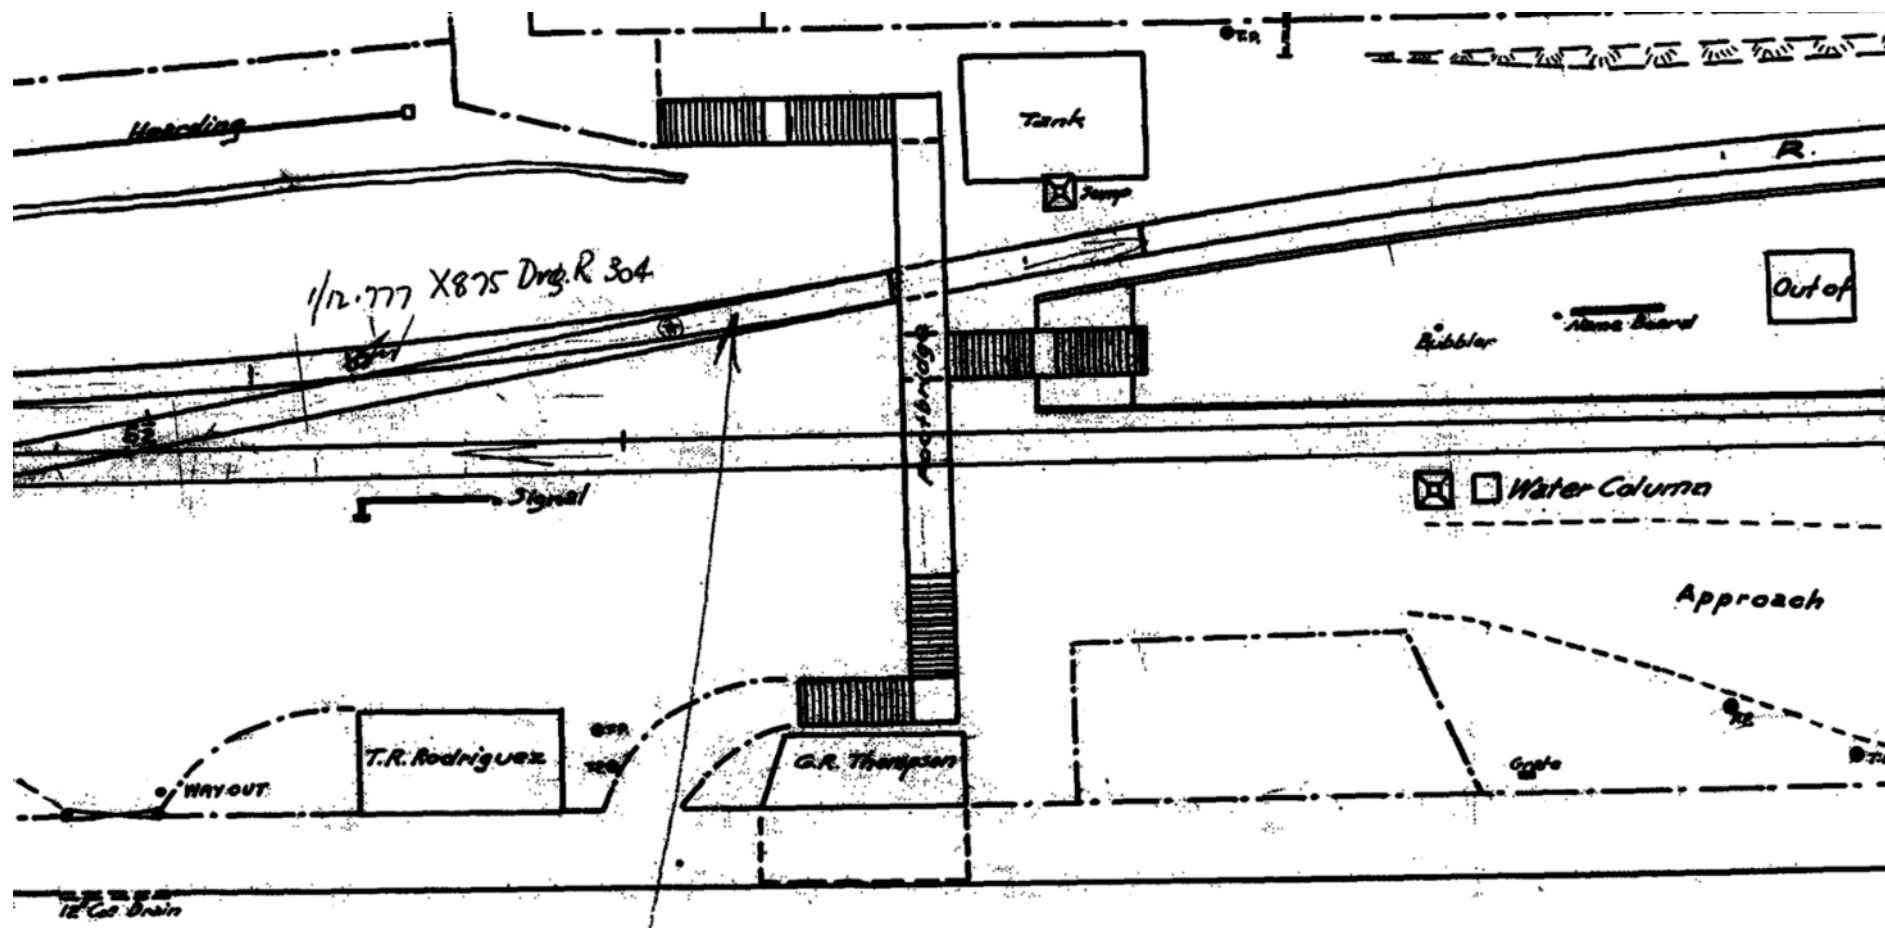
Detail of 1931 plan of Blackheath Station Arrangement showing Blackheath Station Source: Sydney Trains Plan Room, CV0070491.
